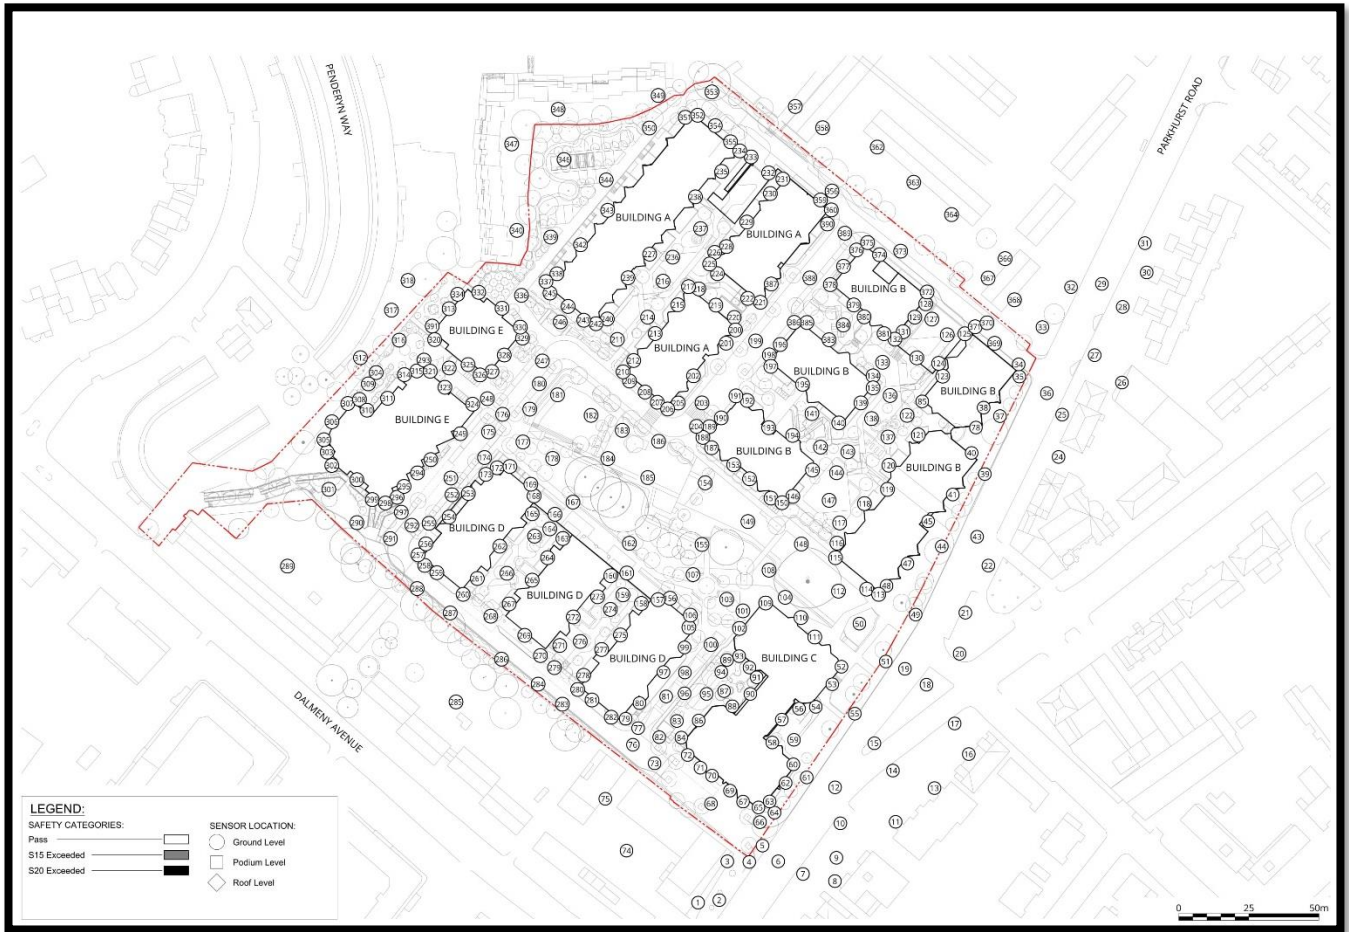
Configuration 3 - The Development with Proposed and Existing Landscaping and Existing Surrounding Buildings - Ground Level Summer Season
